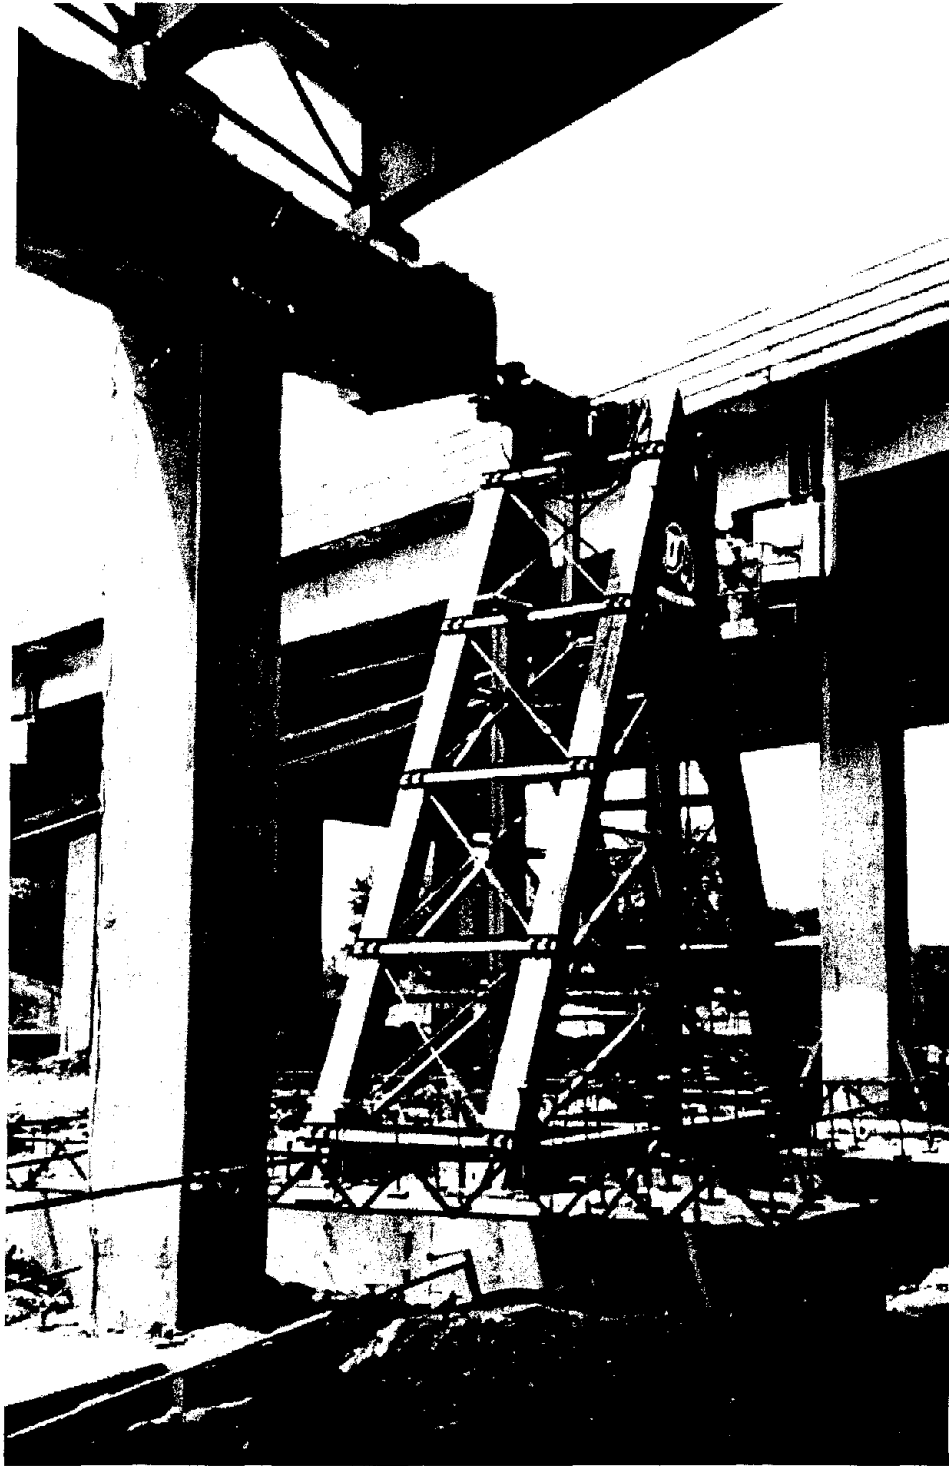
Load frame showing footing details and horizontal Dywidag bars
